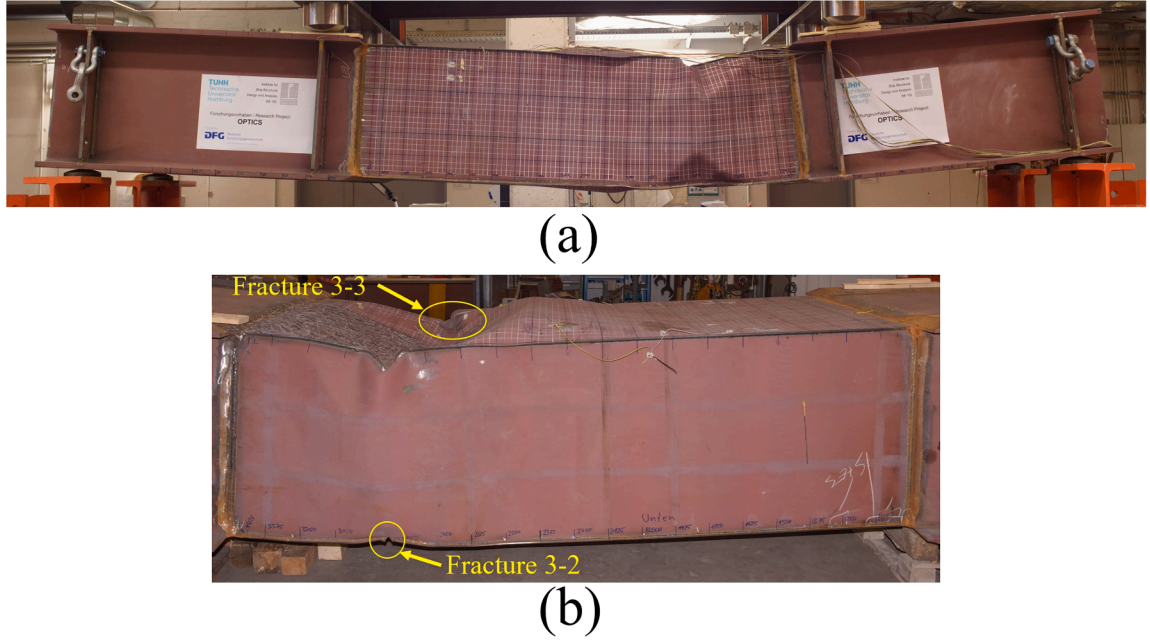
Deformation of the specimen after second half-cycle, from the view of its bottom. Left side of the pictures refers to the forward of the specimen. Details in division 3000 are also shown here. The fracture 2-1 is also shown in Fig. 22.
